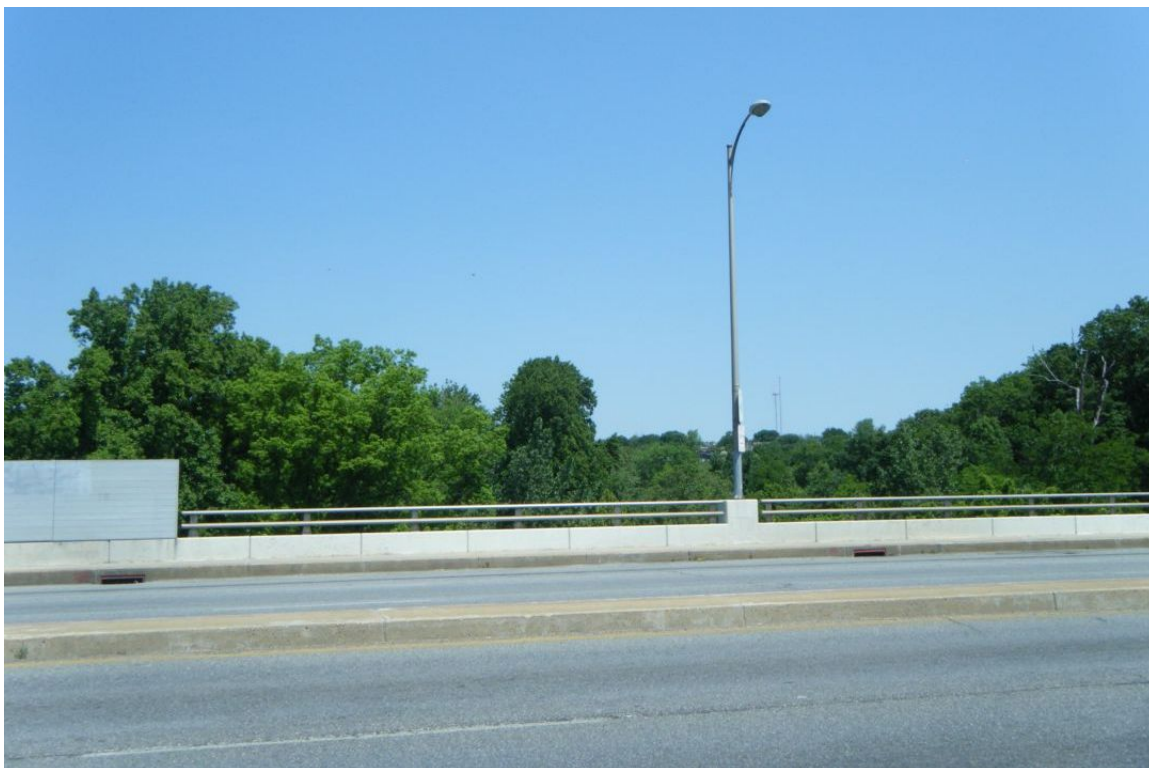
View north toward the proposed at-grade alignment on the Edmondson Avenue Bridge over the Western Maryland Railroad-Tidewater Extension
